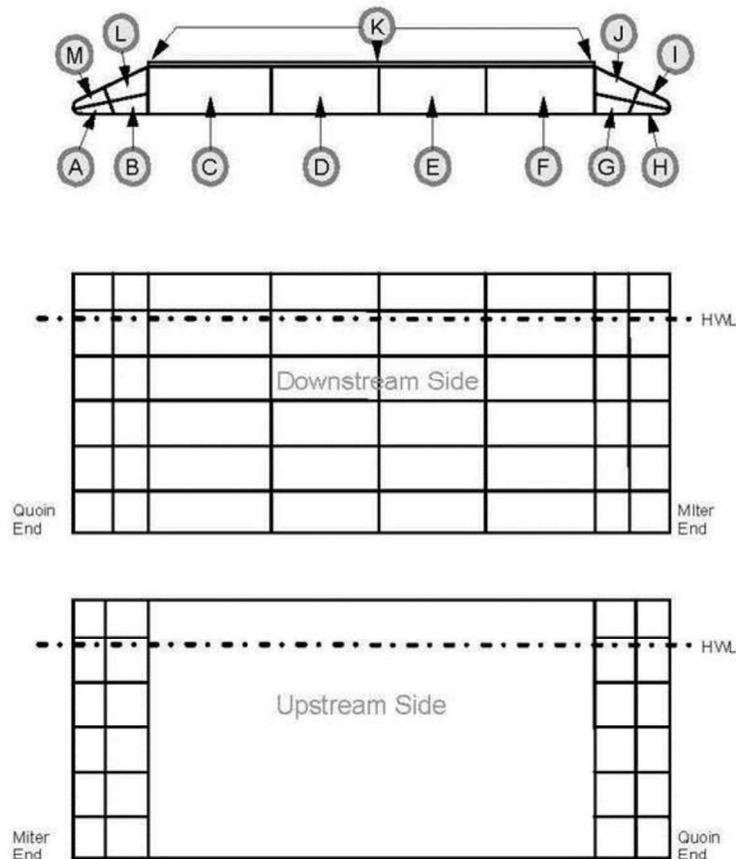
Lock Gate Vertical, Downstream, and Upstream Structural Layout
